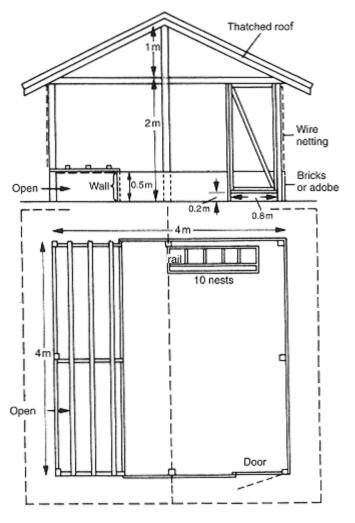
Elevation and plan of a prototype poultry house for 50 laying hens.
